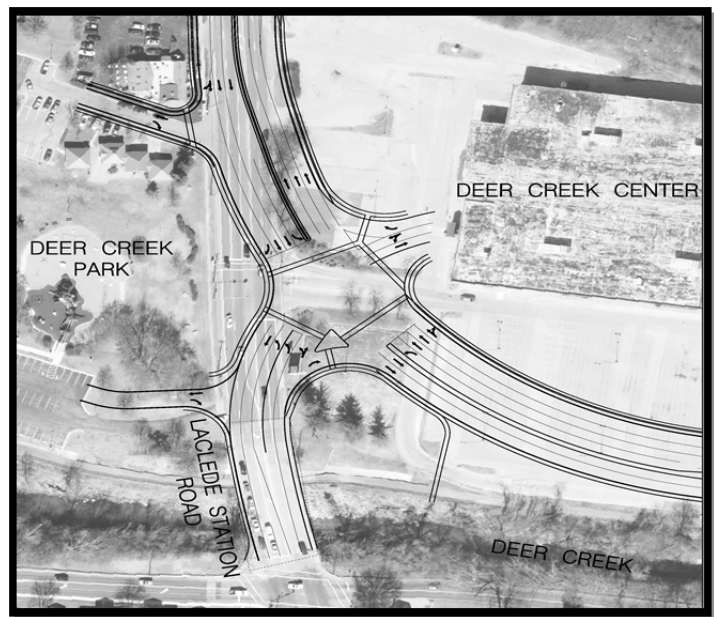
Laclede Station Road - Typical Signalized Intersection
